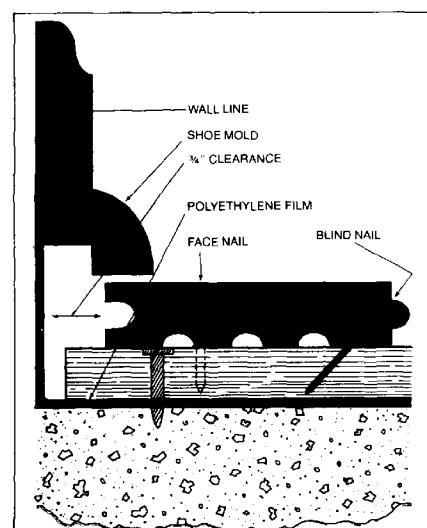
The plywood-on-slab method of installing strip hardwood flooring.
